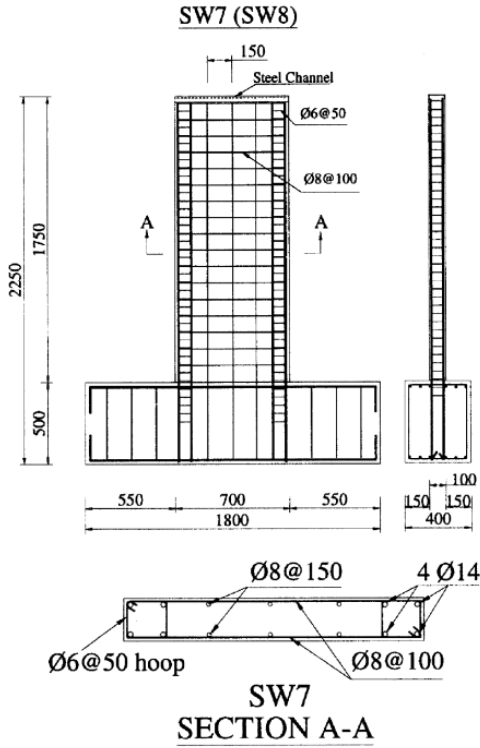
Details of Specimen ZSW7 (Zhang and Wang, 2000)
